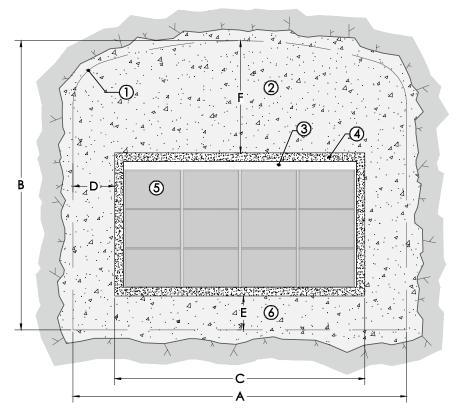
Schematic cross-sectional layout of BHK from Elfwing et al. (2013). Legend: 1) Theoretical tunnel contour. 2) Concrete backfill. 3) Grout. 4) Concrete structure (0.5 m). 5) Steel tanks. 6) Concrete. Approximate dimensions: A = 20.6 m, B = 19.6 m, C = 15 m, D = 2.8 m, E = 2.4 m, F = 8.8 m.
